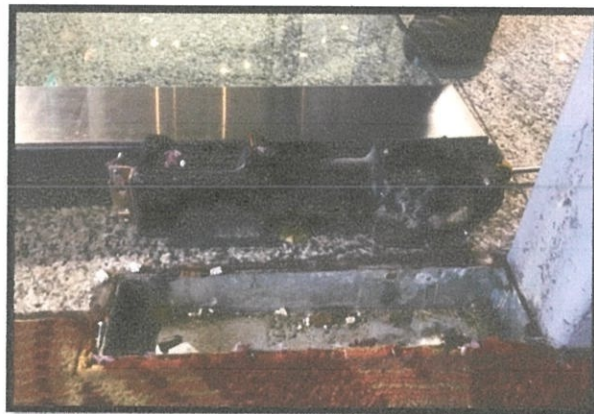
The Floor Spring is Remove from Bottom Strap
